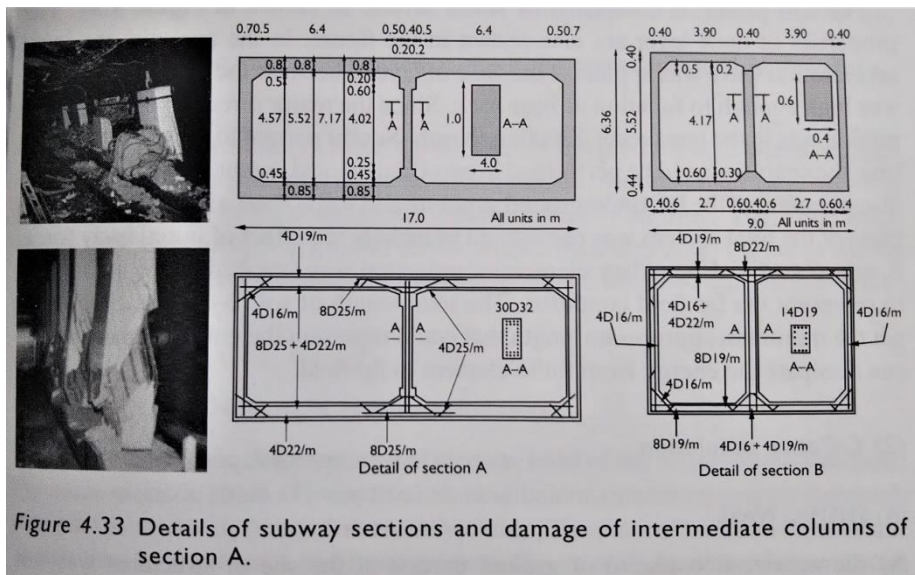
Details of subway sections and damage of intermediate columns of section A.
